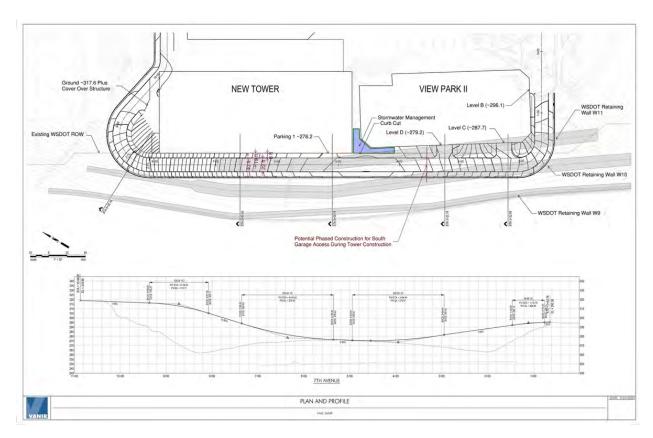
NEW LOOP DRIVE LANE ELEVATION SECTION
